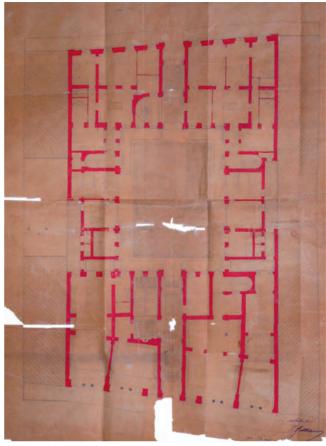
Assan House, arch. P. A. Gottreau. Ground floor plan (ANDMB, PMB Collection, Technical Service, file 15/1873, f. 150).
